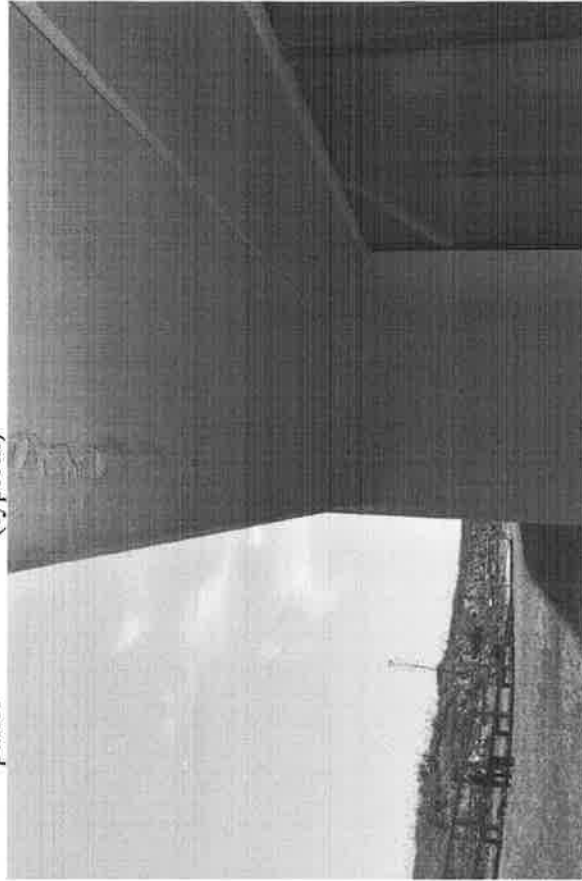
Existing repair to exposed surface of hollow core concrete panel at room 1101 (typical)
